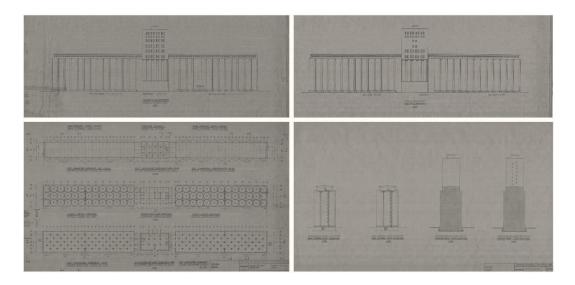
Technical drawings of Güvercinlik Silo, elevations, and plans.
